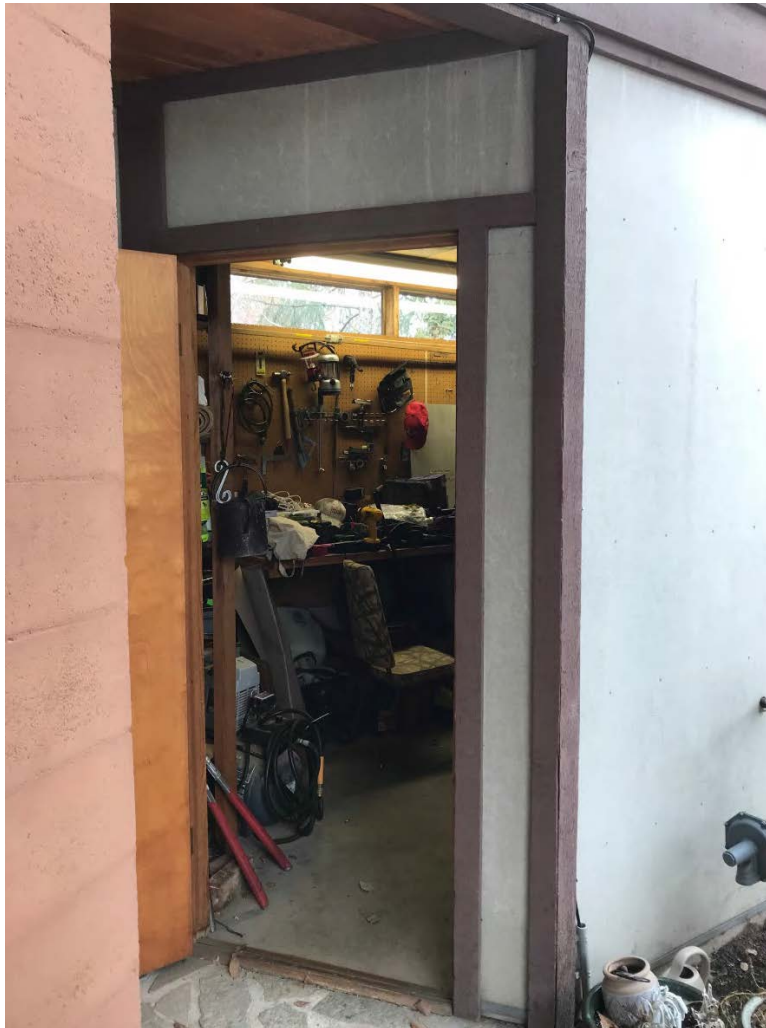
Photo of entrance to shop addition. Photo taken from northwest patio/Zen Garden, looking southwest.
